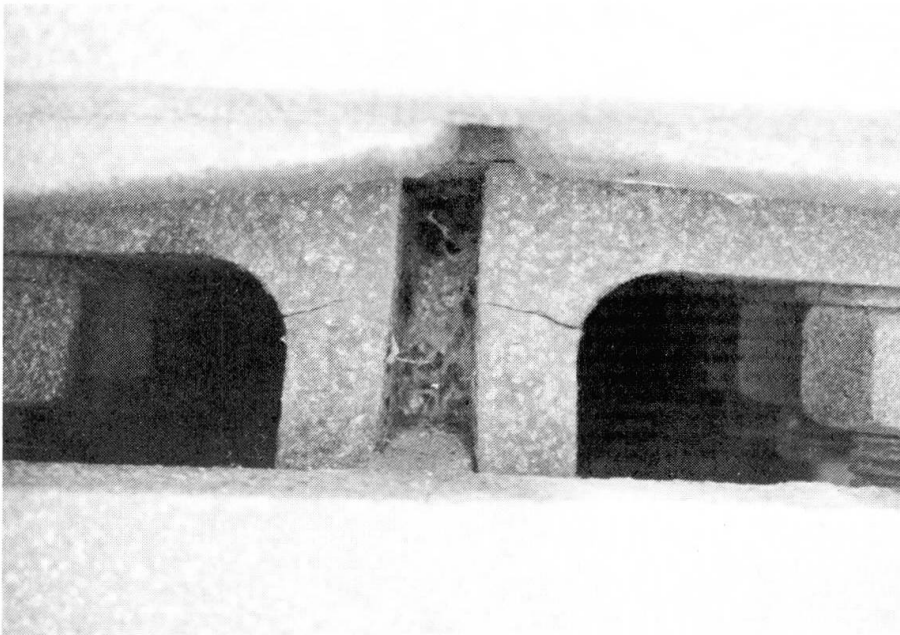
Cross-Sectional View of Angle with Fatigue Cracks
